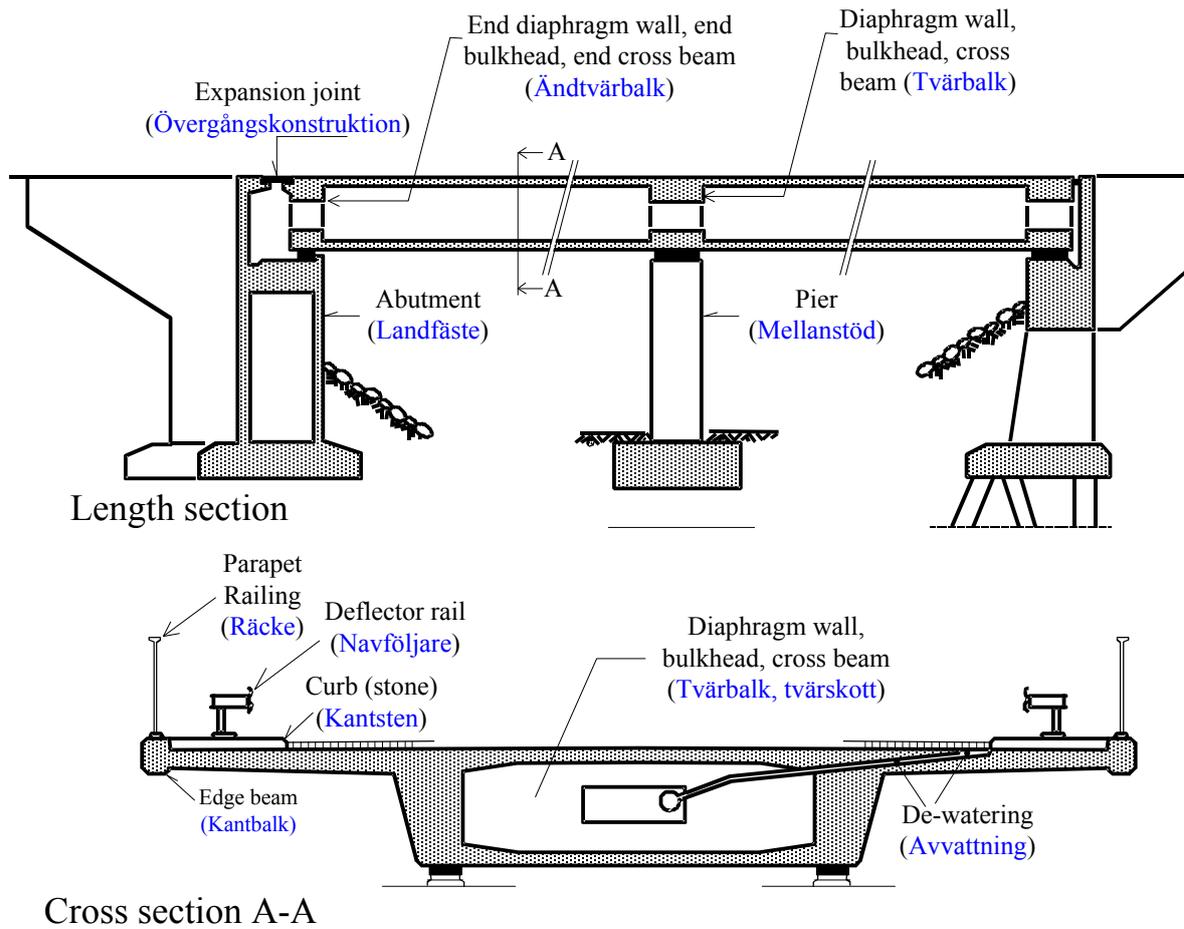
Notations in the longitudinal direction and in the cross direction for a typical box girder bridge with ordinary bearings and expansion joints.
